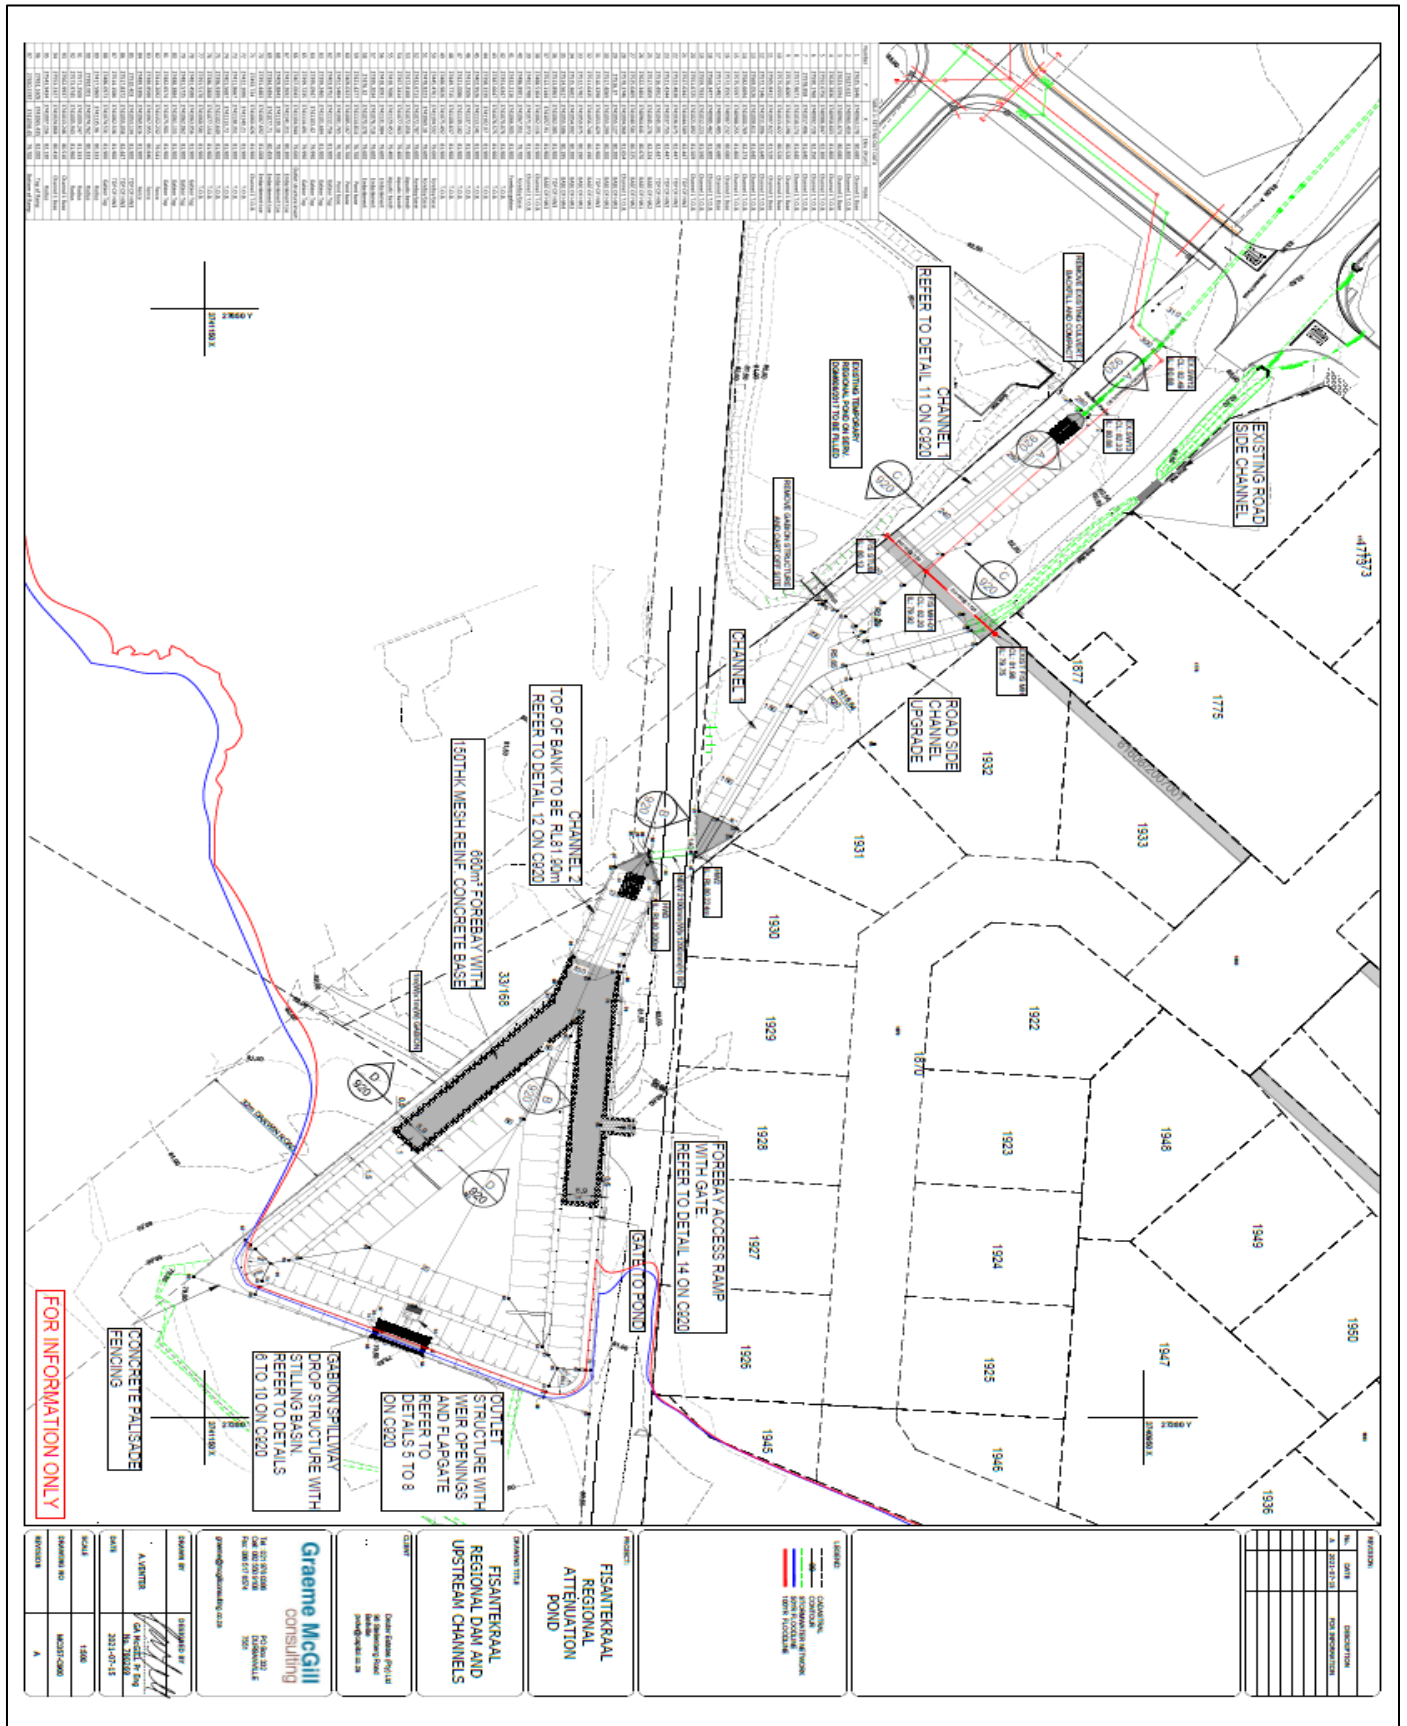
Site Development Plan ("SDP"): Depicting the proposed regional stormwater pond.
